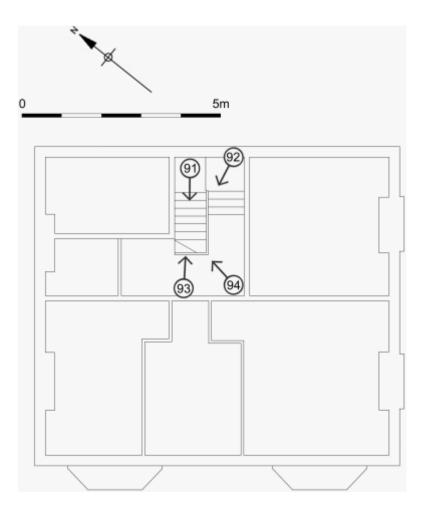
First floor plan of the building showing the location & direction of staircase views (Figs.91-94)
